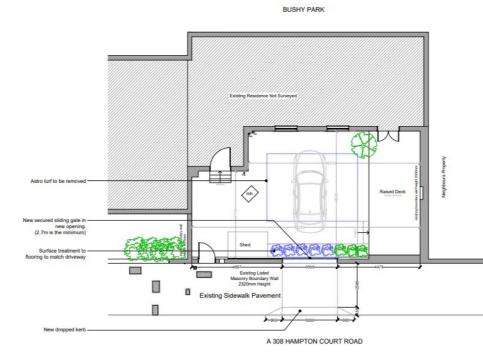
Excerpt from proposed drawings showing site layout, access and recycling arrangements.
